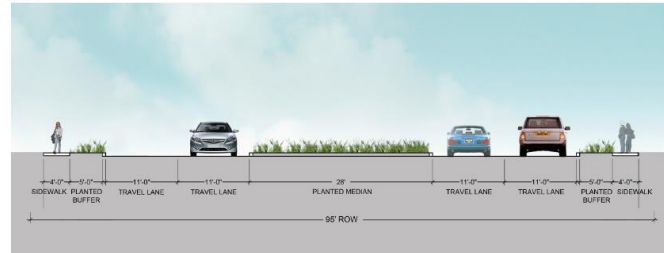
Existing Thoroughfare Conditions - Monroe Road
